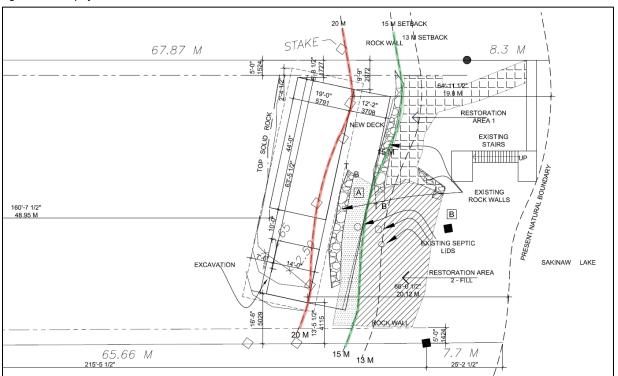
Excerpt from Site Plan (20m setback in RED, 15m setback in GREEN)
